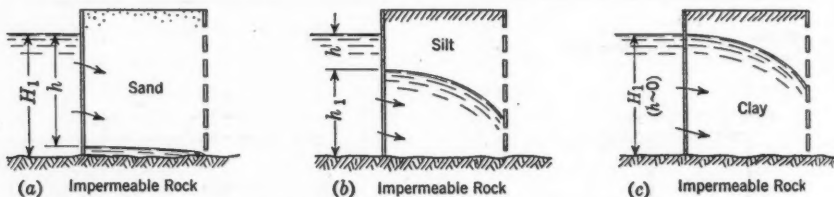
CELLULAR COFFERDAMS ON ROCK FOUNDATIONS
